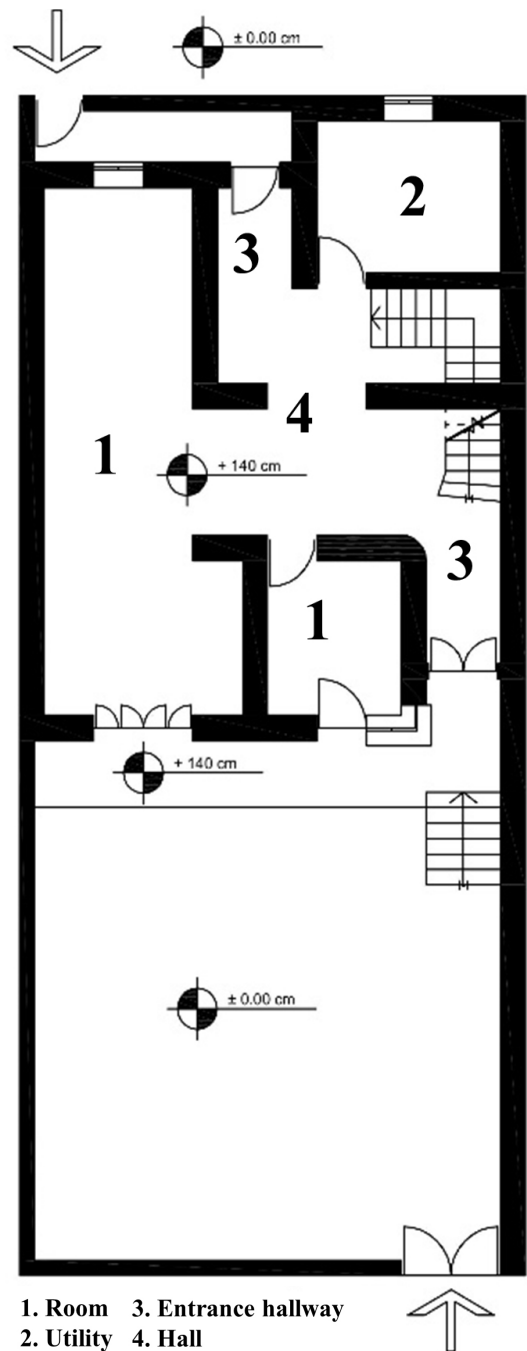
Ground floor plan (1/250) of the House No. 4. Source: Authors.
